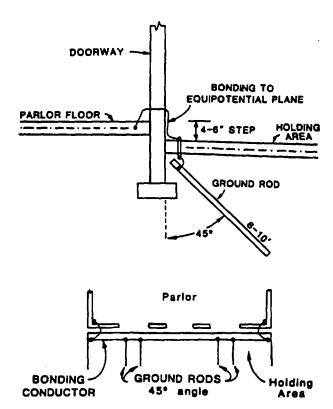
Voltage ramp adjacent to an equipotential plane: top, side view; bottom, frontal view.
